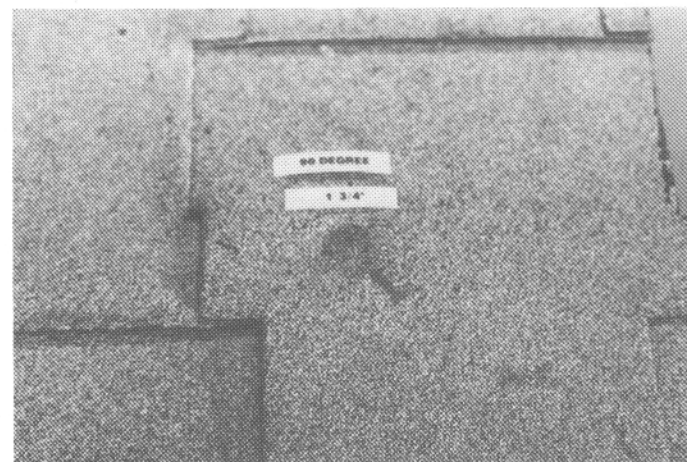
1 3/4 in. hailstone impact/90° angle/Flock shingle.
